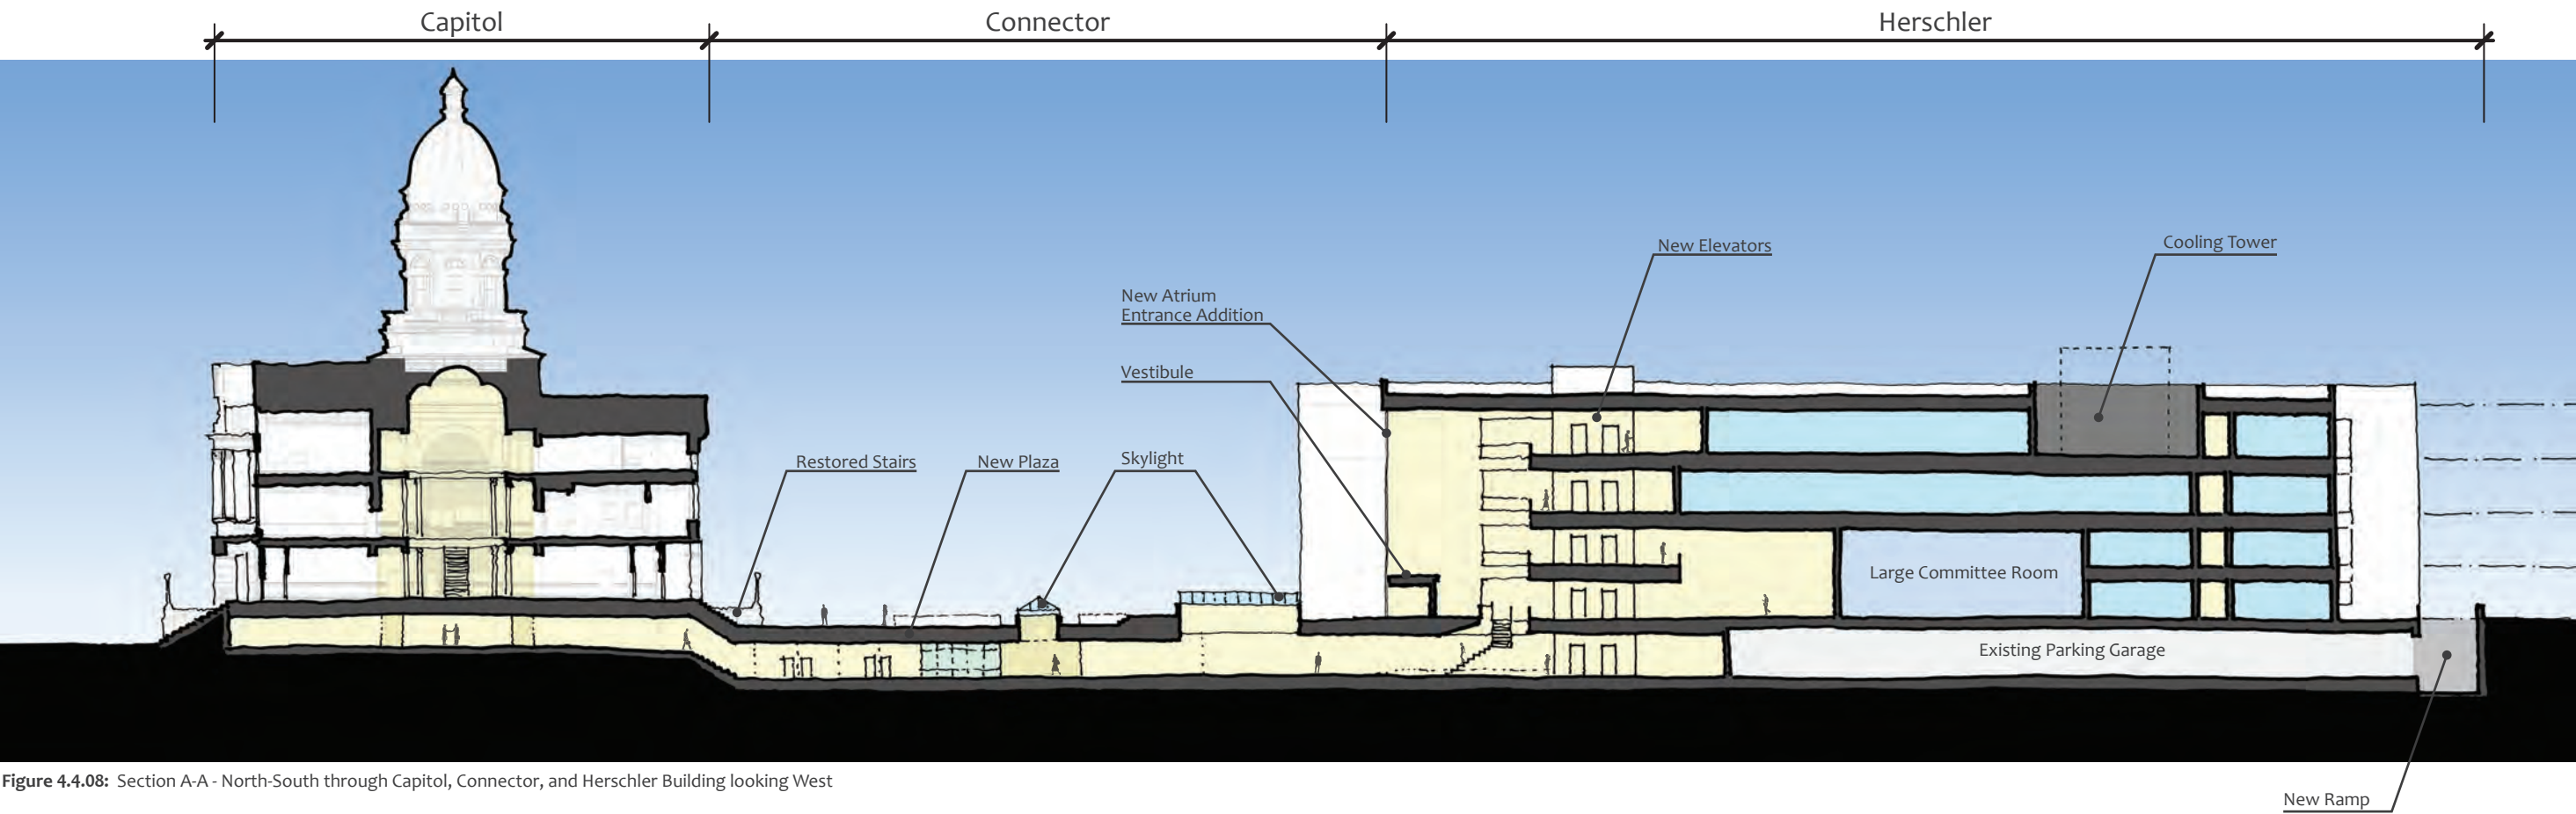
Section A-A - North-South through Capitol, Connector, and Herschler Building looking West
